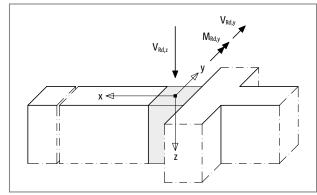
Schöck Isokorb® XT type W: Sign rule for the design
